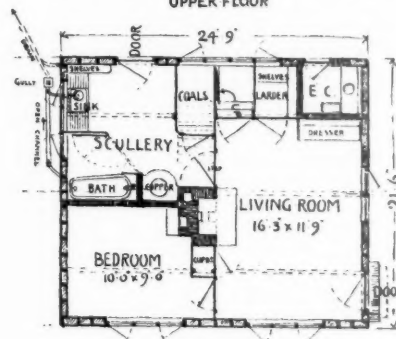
BRICK COTTAGE. A. RANDALL WELLS, ARCHITECT.
